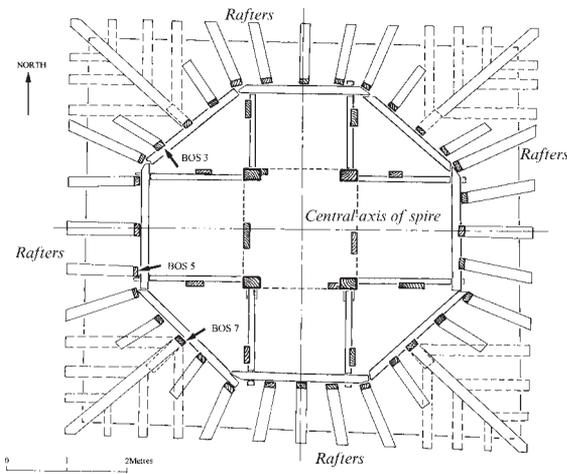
Plan showing the brackets, purlins or plates, and rafters.
